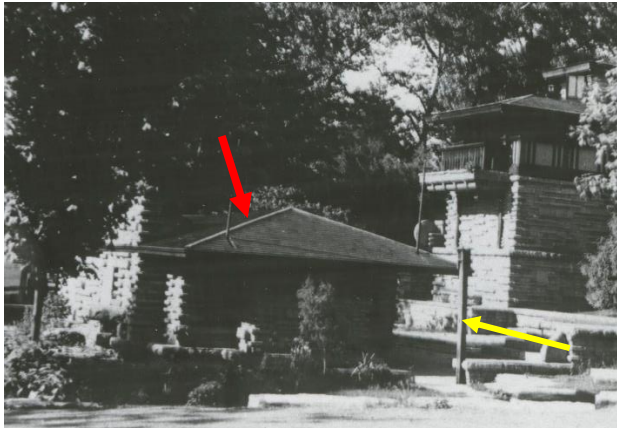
View of the south elevation of the Veranda Rooms, circa late 1940s. (Source: Center for Dubuque History at Loras College) The image shows the Veranda Rooms roof with ridge caps at the hip ridges (red arrow). Similar ridge caps are visible at the Bridge Complex, beyond. Note that the historic lamp posts remain (yellow arrow).
